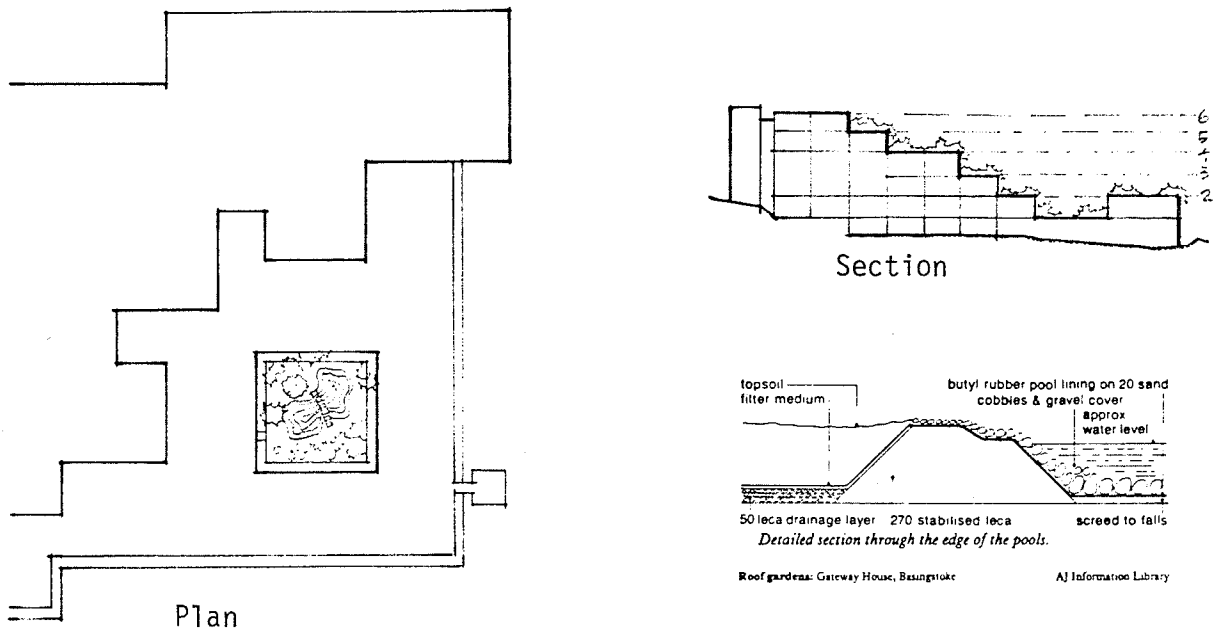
Plan, Section and Detail of Gateway House, Basingstoke
